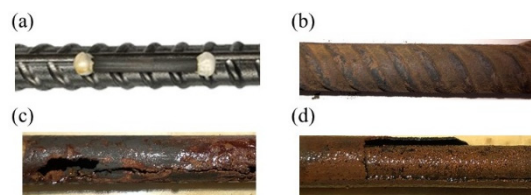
(a) Steel tubes fixed on rebar; (b) corroded rebar; (c) corroded single steel tube; and (d) corroded double tubes
